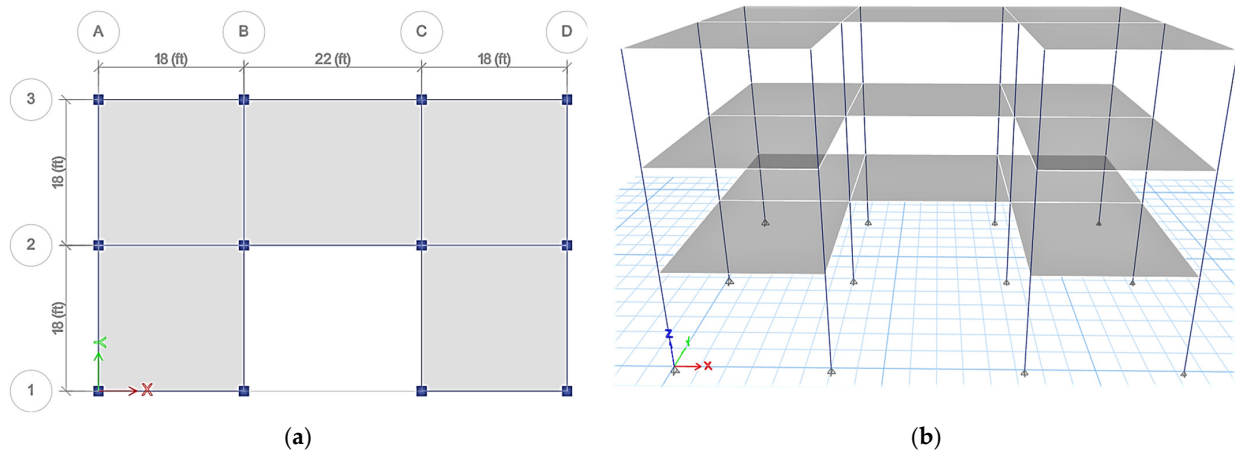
Design of building in CSI ETABS: (a) Ground floor plan; (b) 3-Dimensional view.
